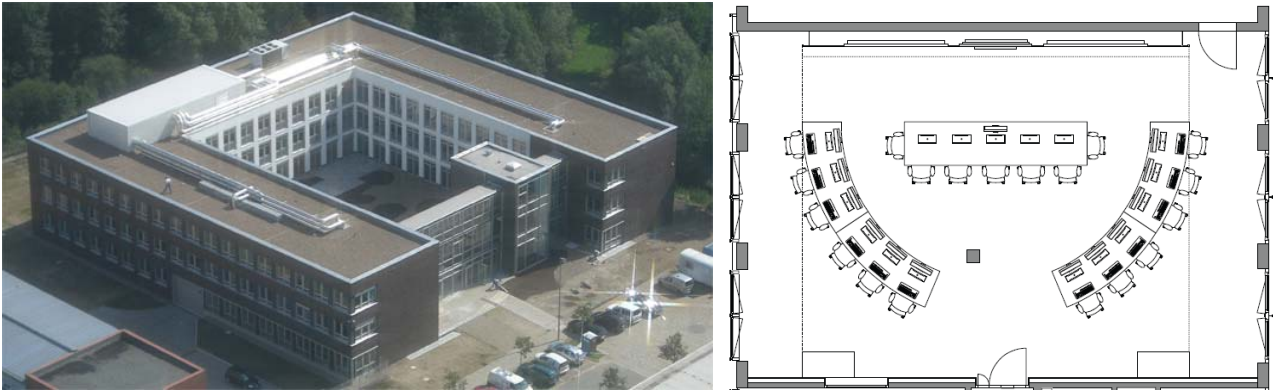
The building of the Institute of Space Systems at Bremen (left) and the layout of the main conferencing room (right)
